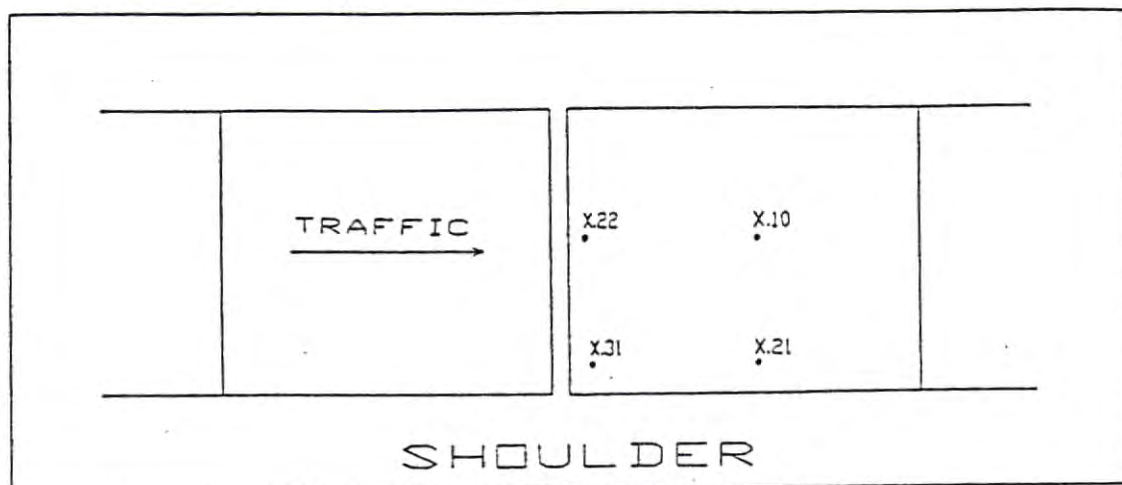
Slab Layout Showing Deflection Testing Locations.
